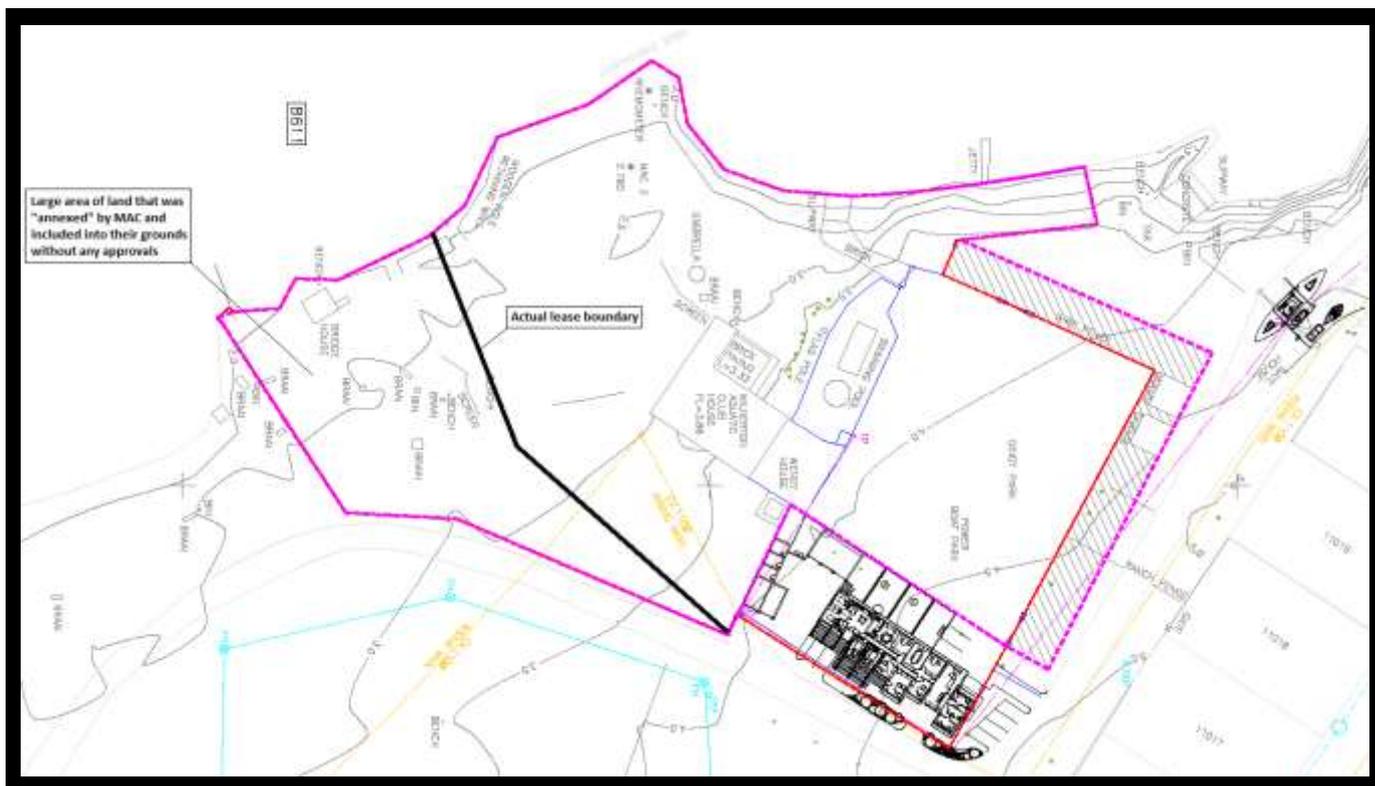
Location plan of the Milnerton Aquatic Club and proposed Rietvlei office.
